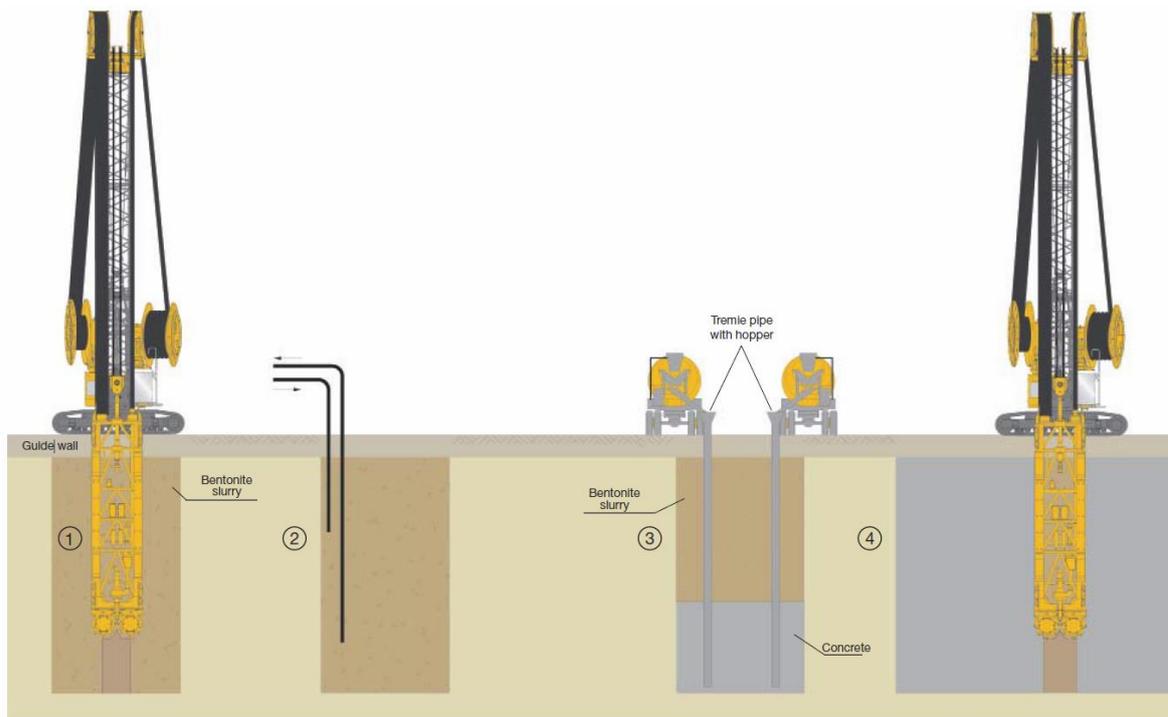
Two phase diaphragm wall construction sequence (Bauer)
